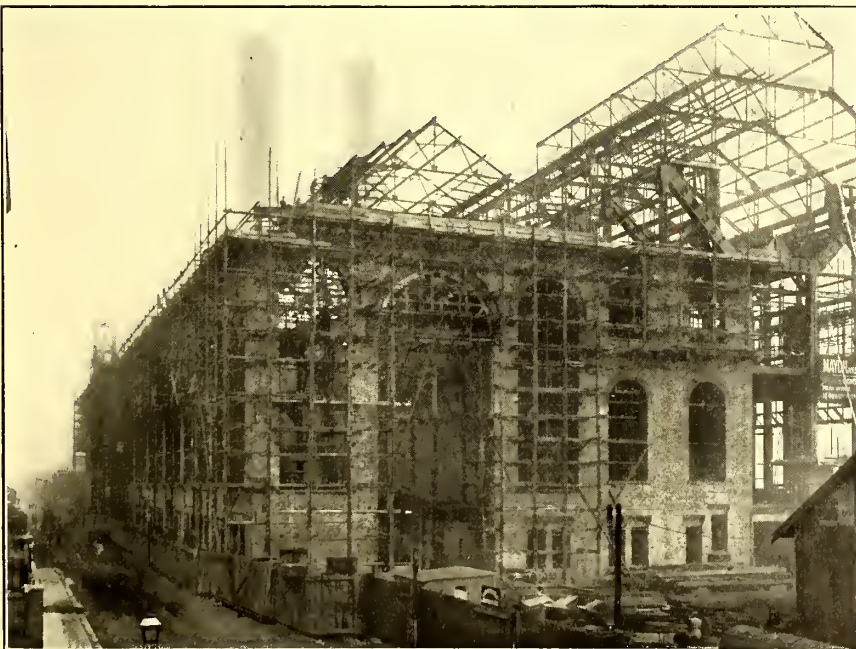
WEST ELEVATION OF CHELSEA GENERATING STATION
